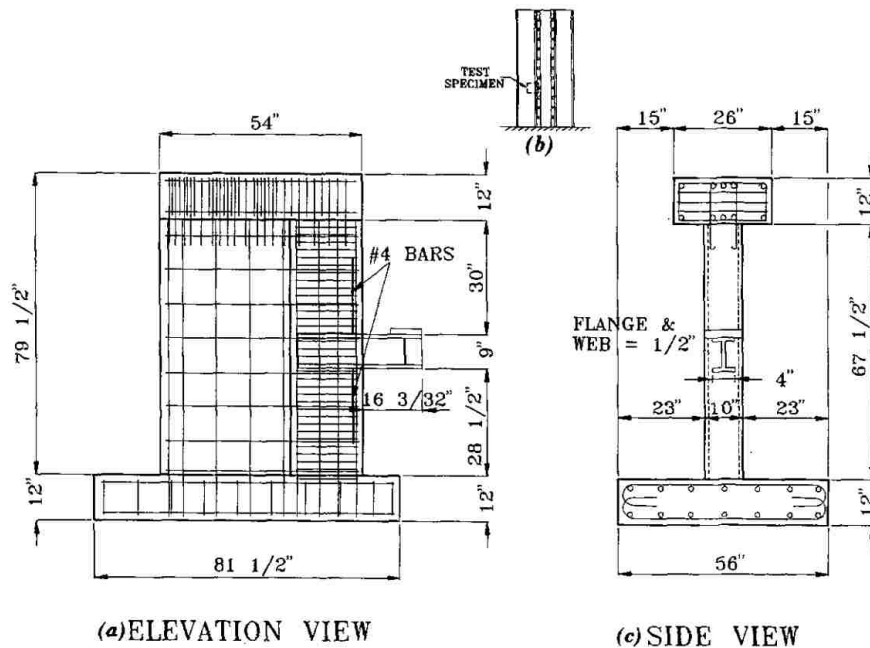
Test Specimen Dimensions (Shahrooz, et al)
